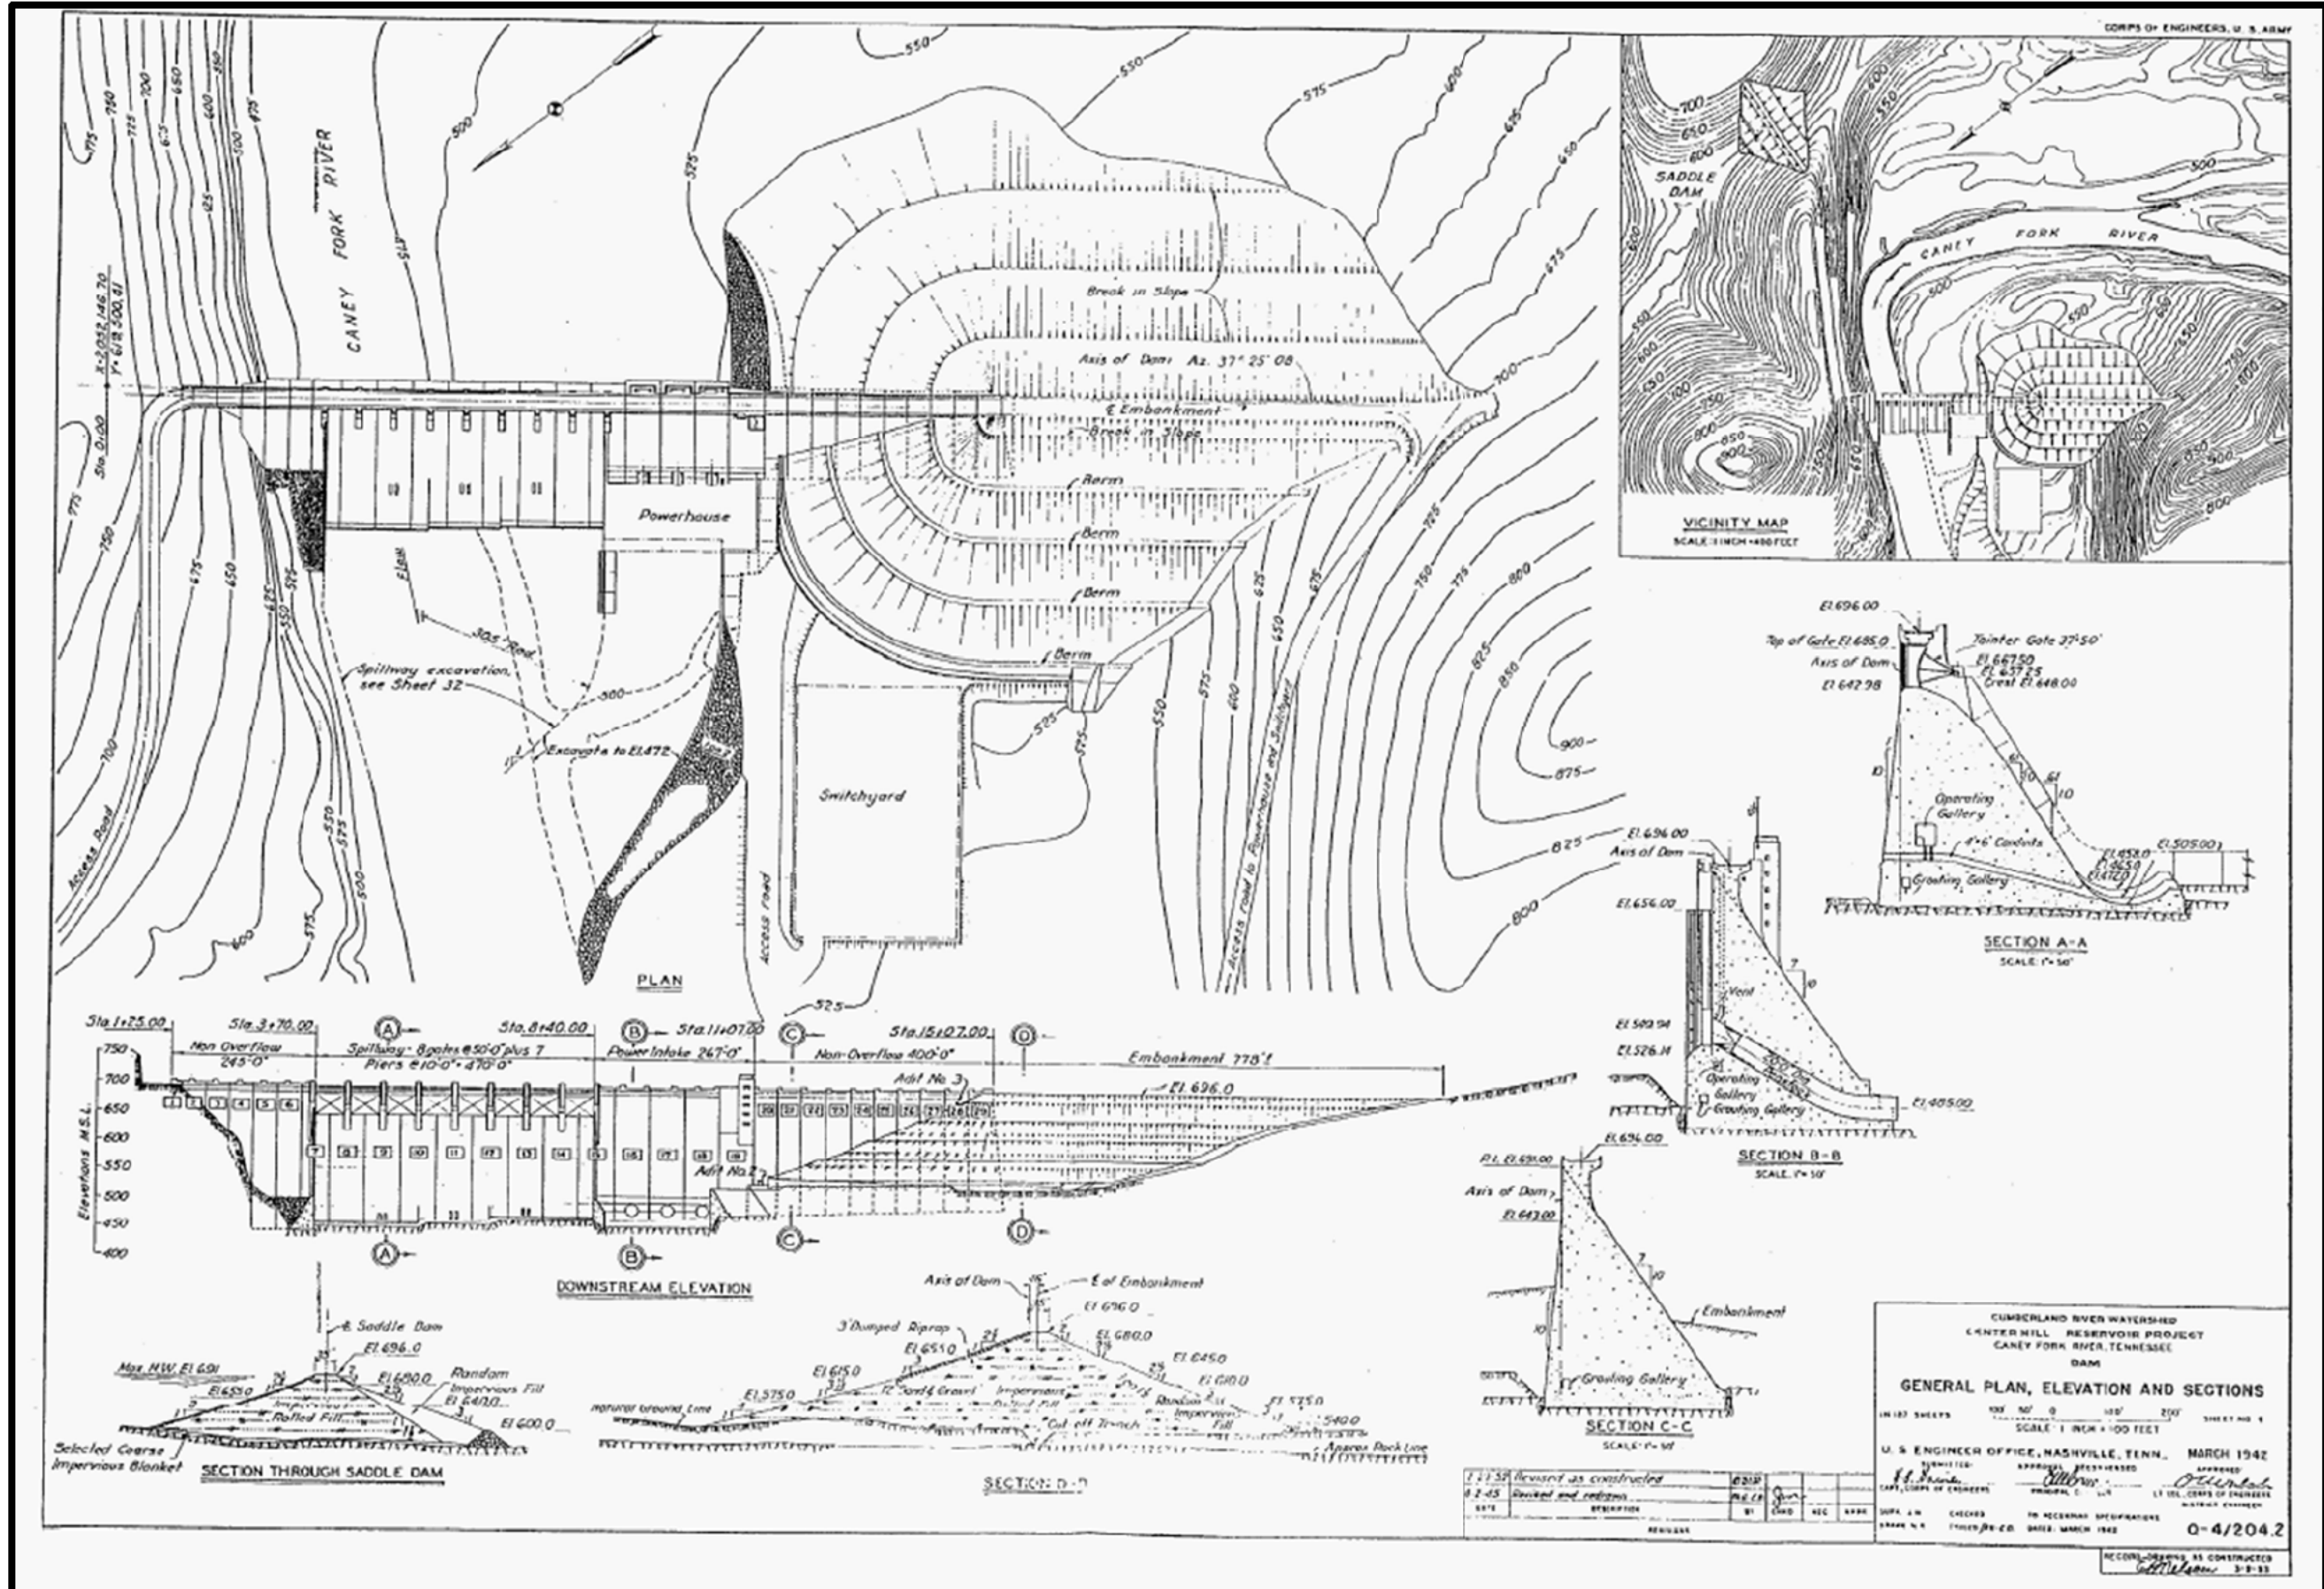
Center Hill Dam, General Plan, Elevations, and Sections
